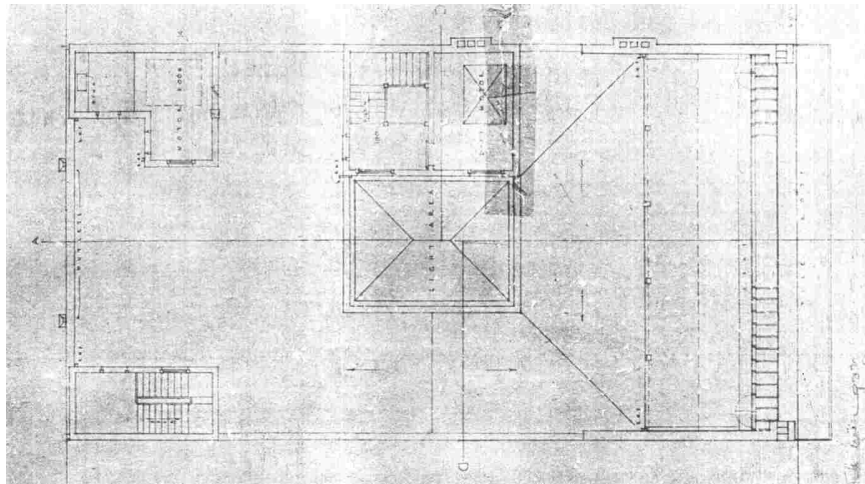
Plan of the roof floor by Wilson, Neave and Berry, 1922 (Source: City of Sydney Archives, BA 74/22)
